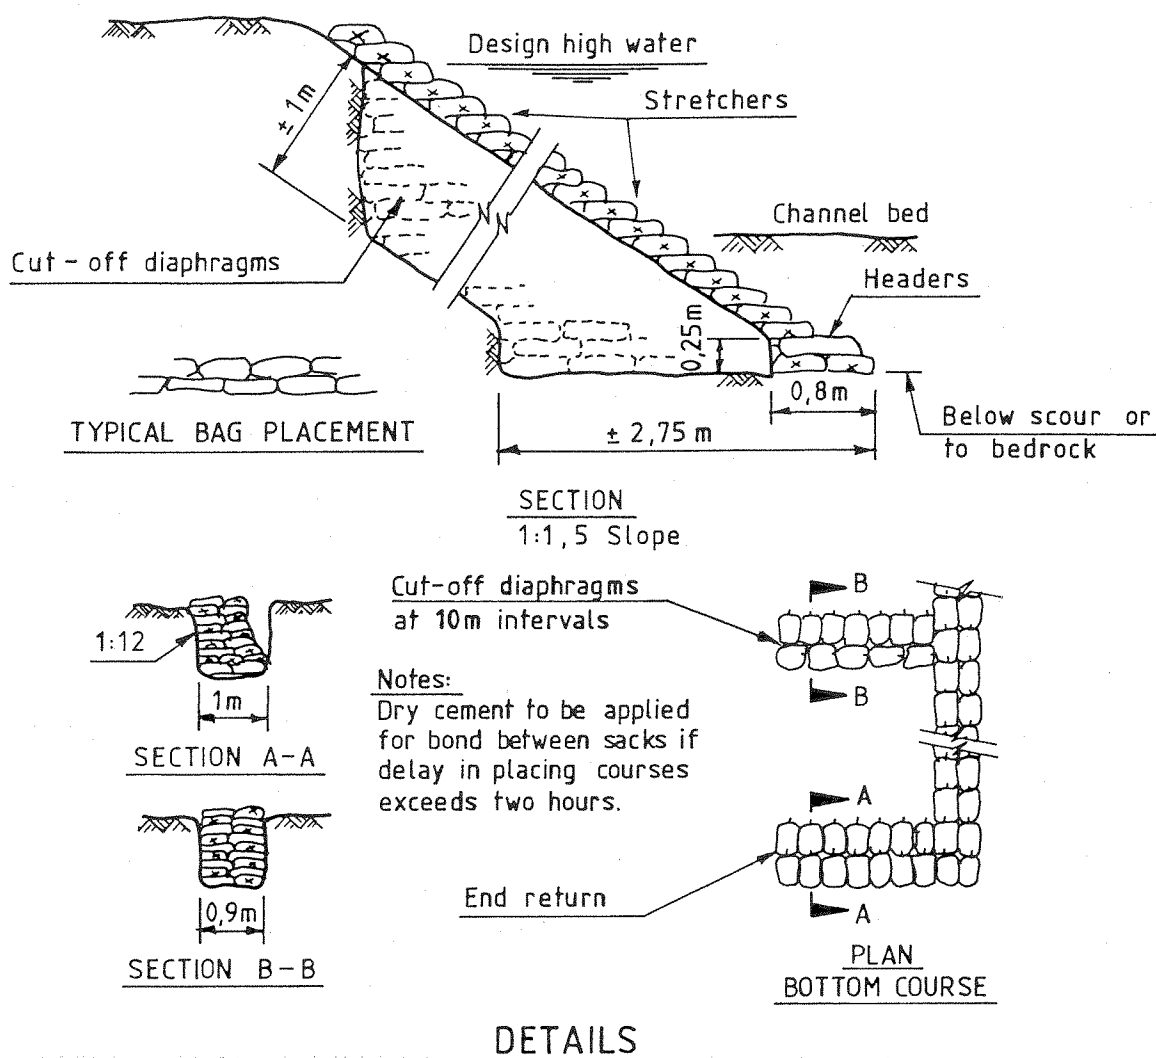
DETAILS OF SAND-CEMENT BAG PROTECTION ON 1 : 1,5 SLOPE
